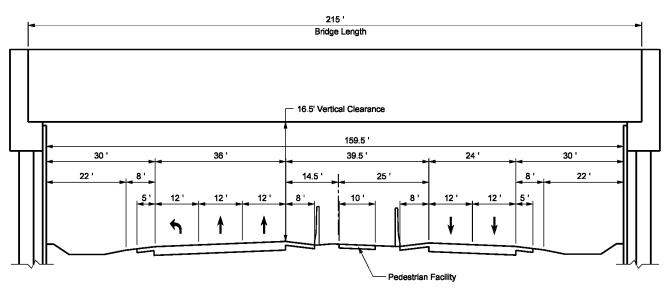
BUILD ALTERNATIVE NO. 2 PROPOSED TYPICAL SECTION – SR 33 UNDER I-4 LOOKING NORTH
